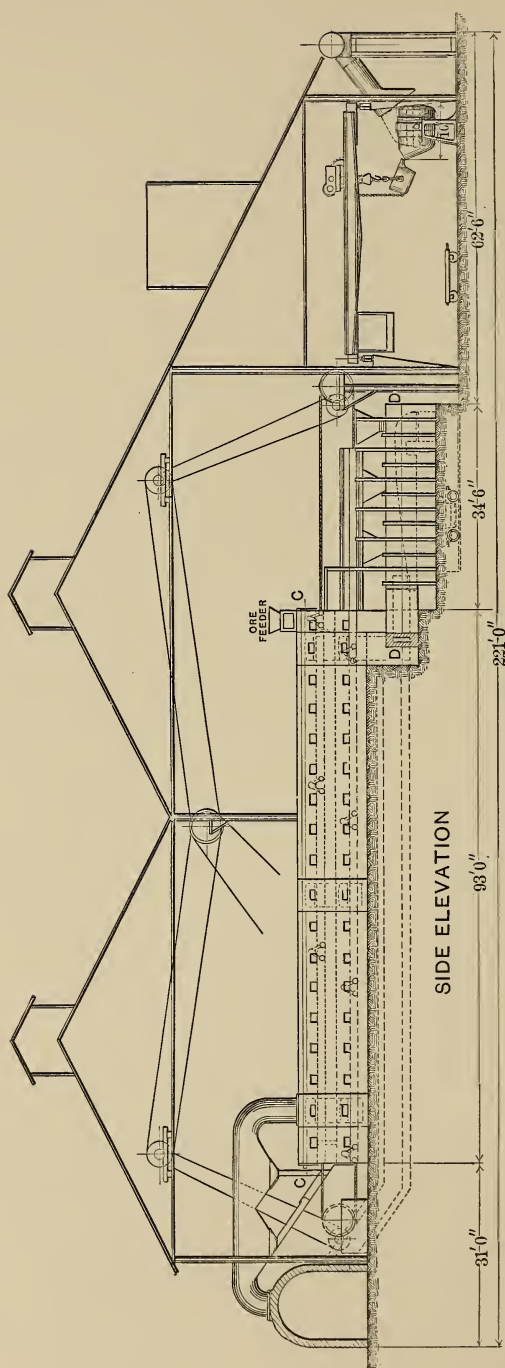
PROPOSED COMBINATION OF ROASTING SMELTING, AND CONVERTING PLANTS; ELEVATION
